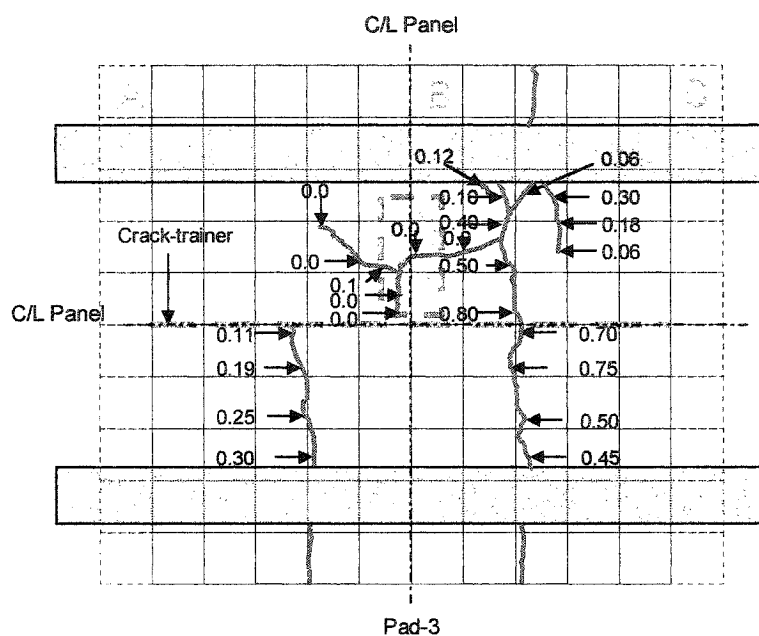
Panel-B: Crack Patterns on Soffit after 100 Load Cycles
